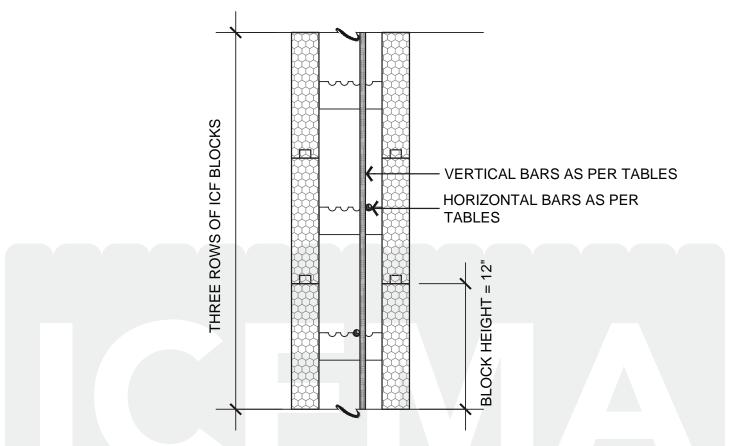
Below Grade Wall Reinforcing Placement for All Wall Thicknesses.
